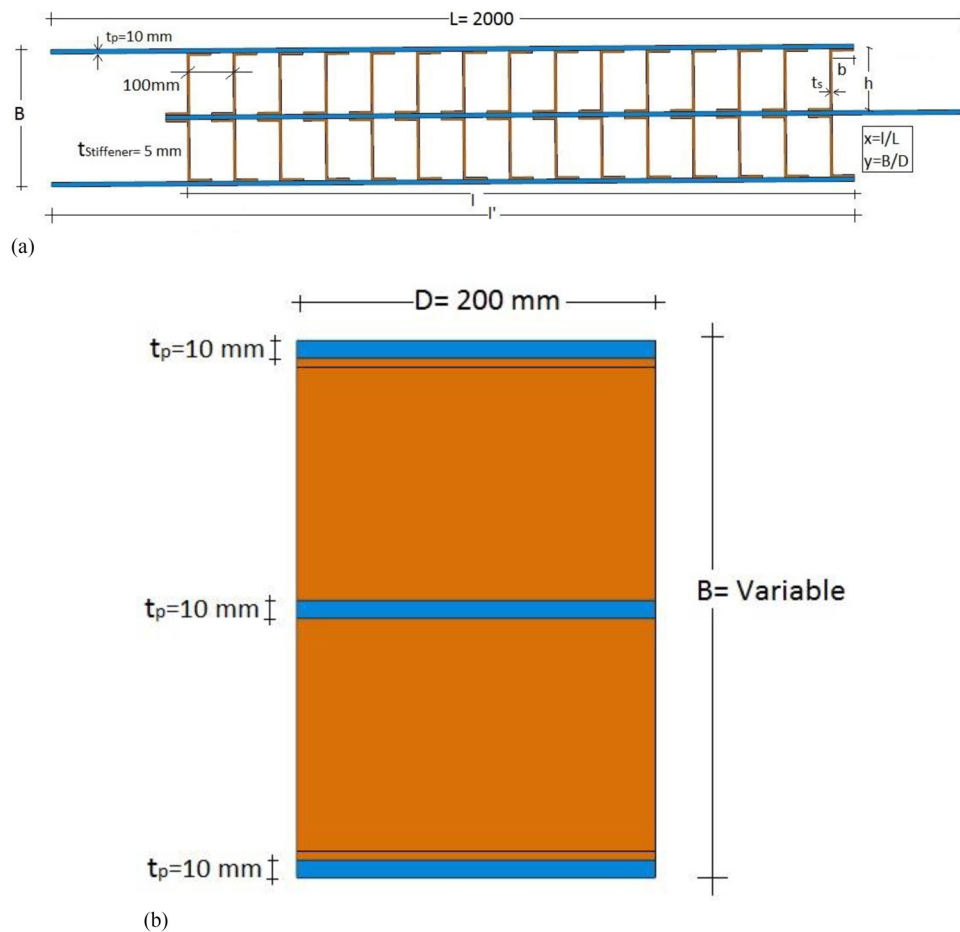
Proposed BRB: (a) lateral view; (b) cross section with dimensions
